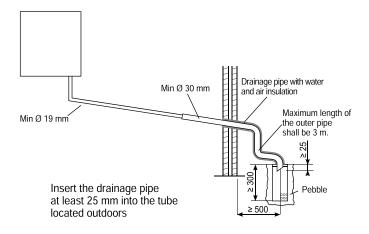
Outside Connection of Condensate Water Drainage Pipe
